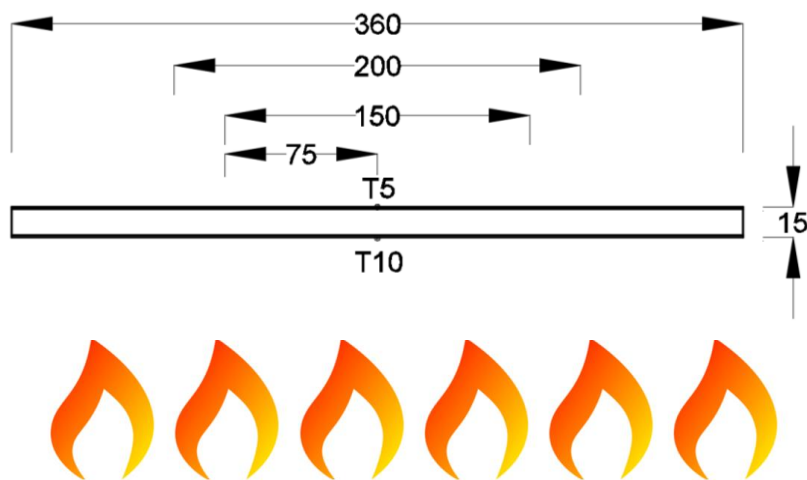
Horizontal Cross-Sectional View of Corner Thermocouples
